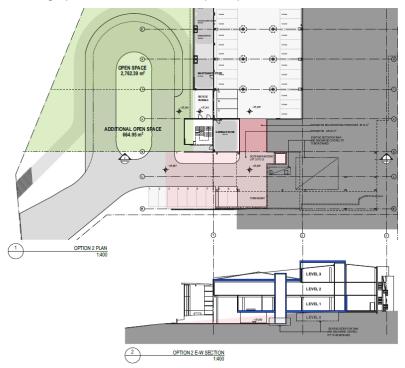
Car Park Entry - Option 2 (Source: TZG Architects, SK001, 07.06.2019).
